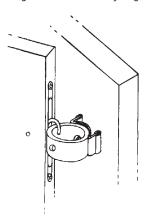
A 'OD' Receiver & Wall Bracket BRLOR attach panels to walls at variable angles
